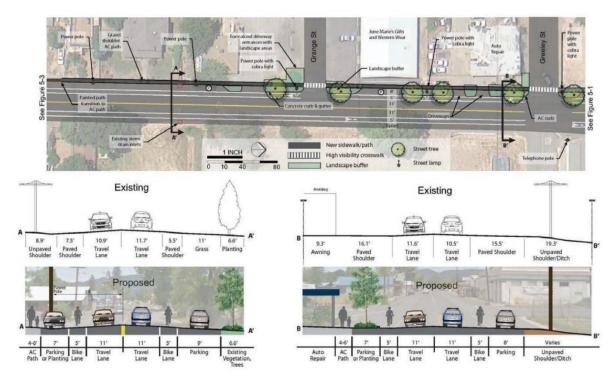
Highway 162 Pedestrian Improvement Recommendations from Grange Street to Greeley Street – Map 5-2 (Source: Covelo/Round Valley Non-Motorized Needs Assessment & Engineered Feasibility Study, 2014)
